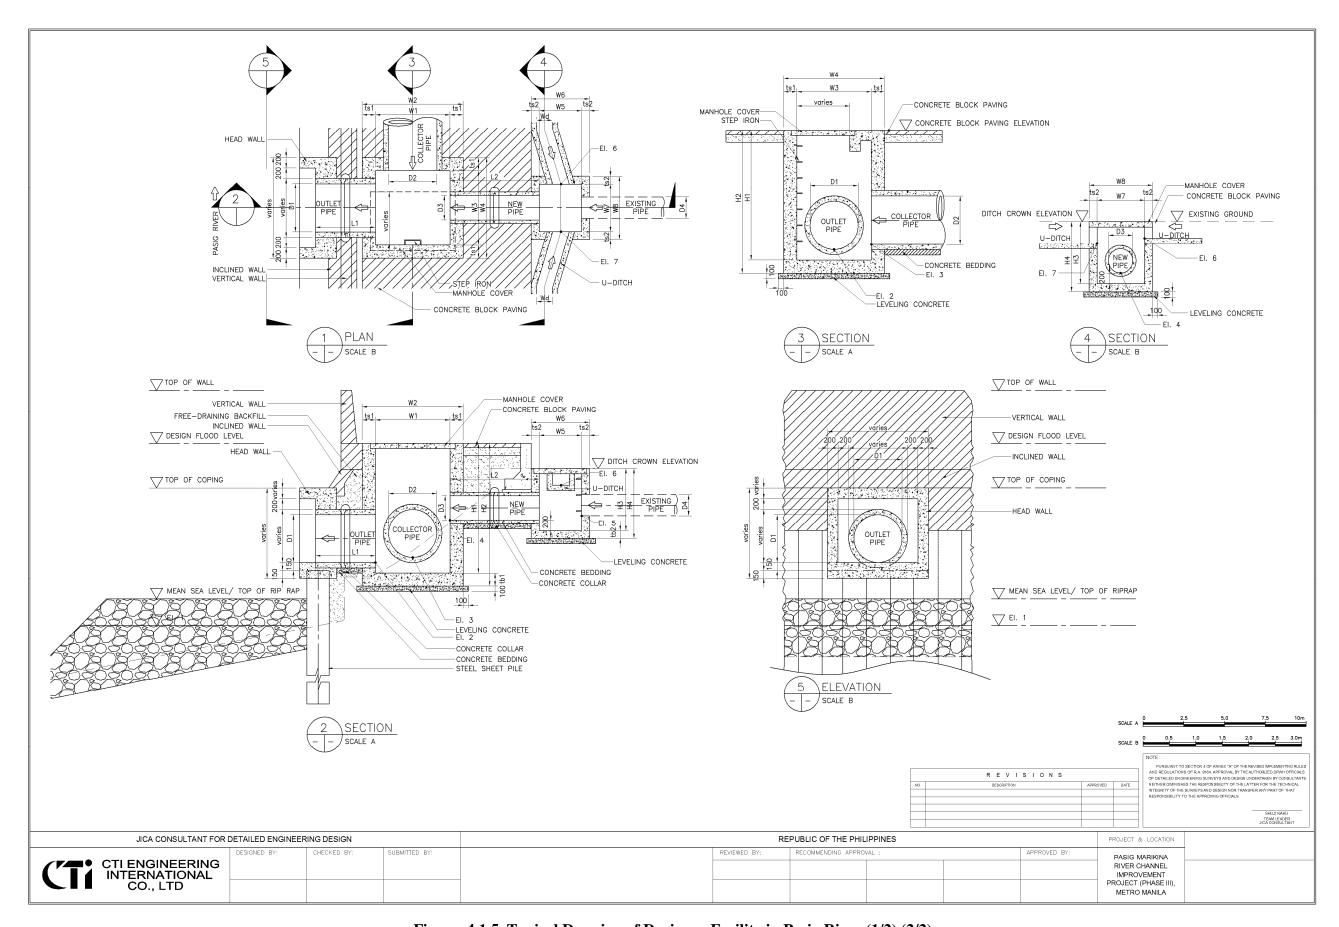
Typical Drawing of Drainage Facility in Pasig River (1/2) (2/2)
